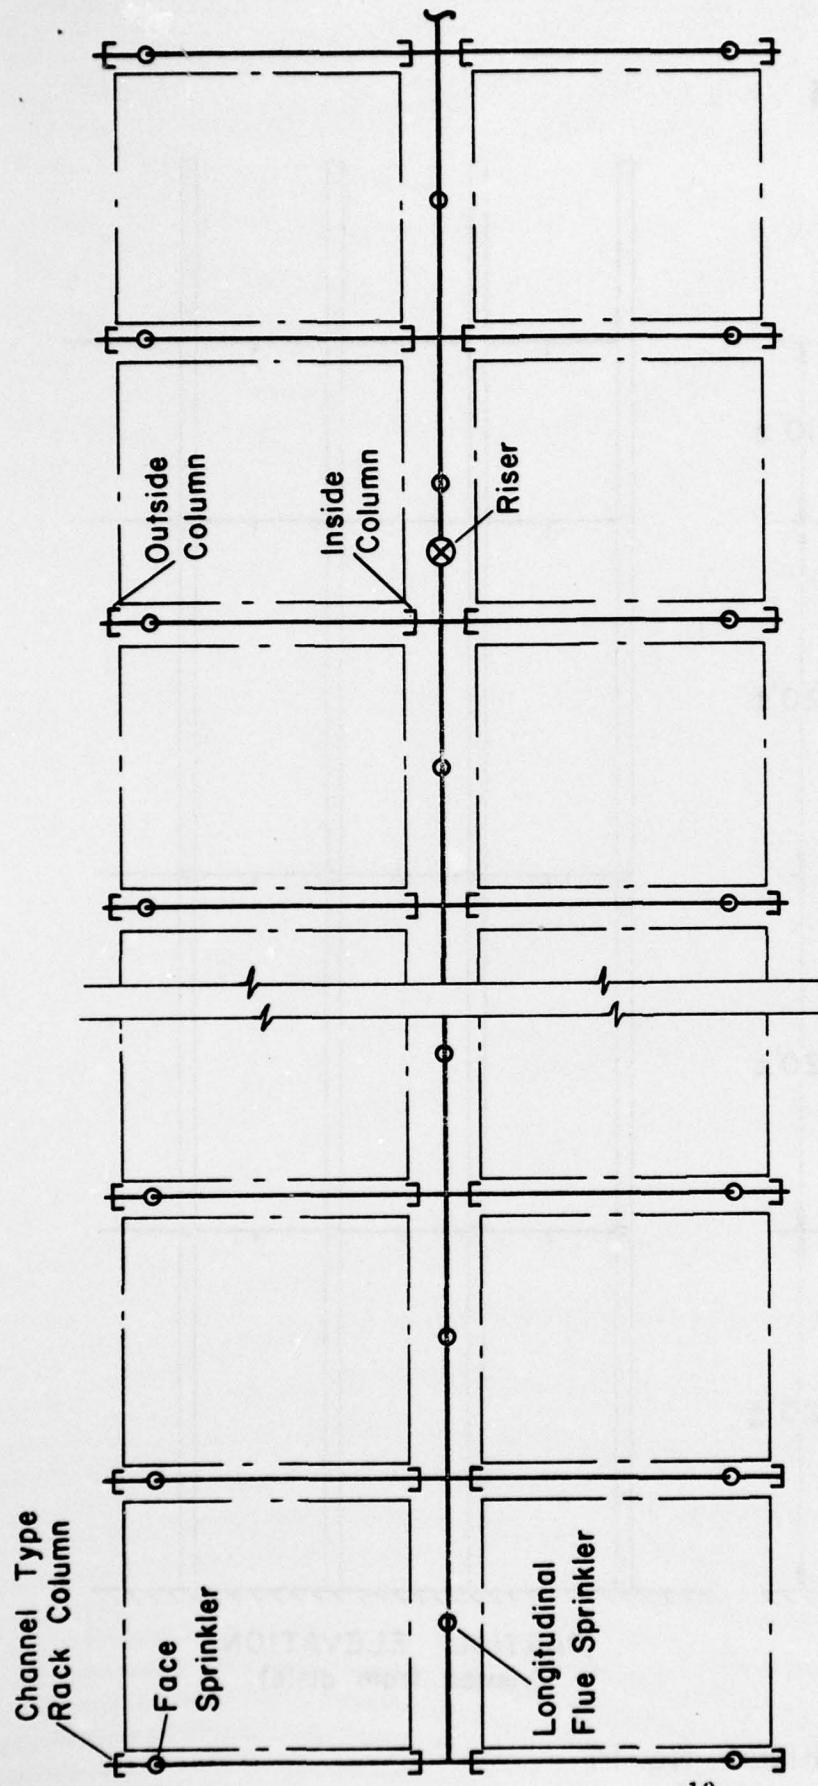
Partial Plan View of Integrated Sprinkler System Utilizing Standard Circular Pipes.
